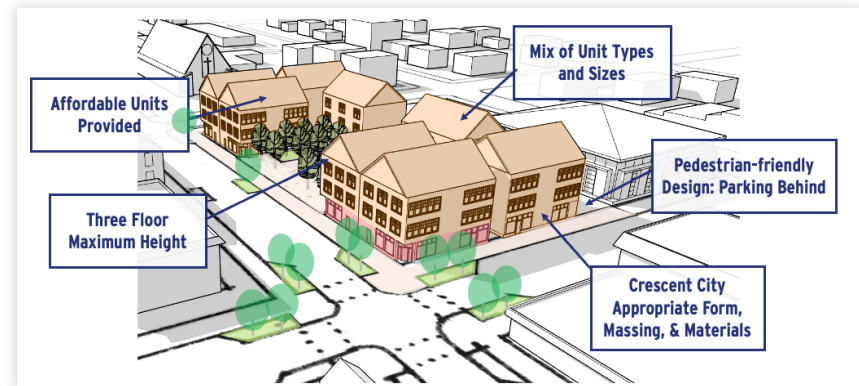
Anchor Development Site- Third Street and G Street Option 2
